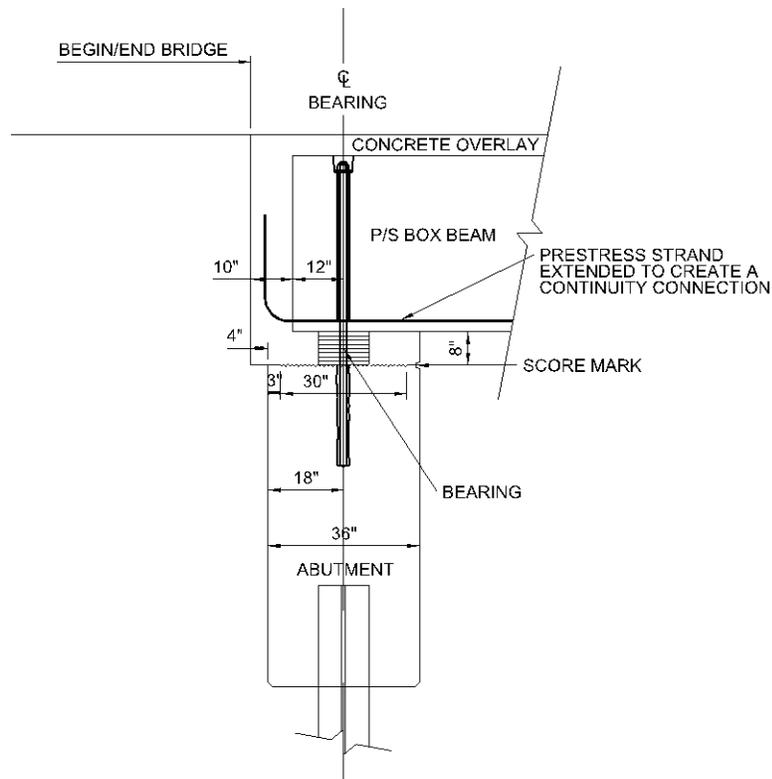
1 Box Beam Type B Bridge End Detail
